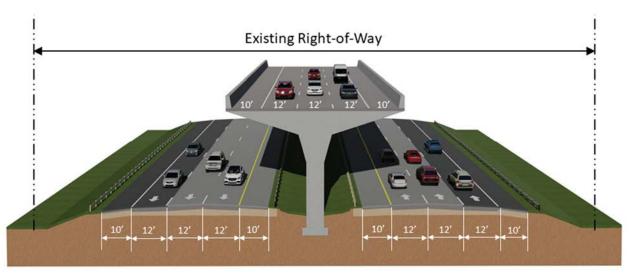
The resulting typical section would include three 12-foot wide travel lanes with 10-foot wide inside and outside shoulders in each direction. No improvements to the REL are proposed. The REL would remain with three 12-foot wide travel lanes and 10-foot wide inside and outside shoulders.
